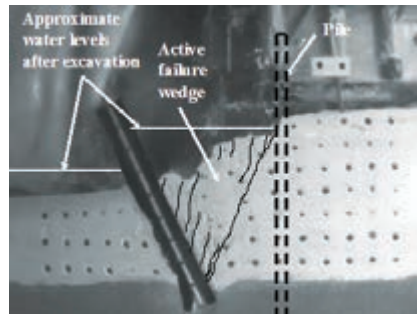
High resolution pictures showing failure mechanism of soil behind retaining wall [10]
